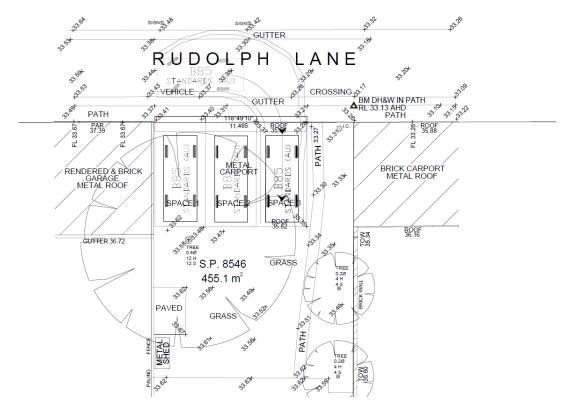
Swept Wheel Path for a vehicle turning right into space three.
